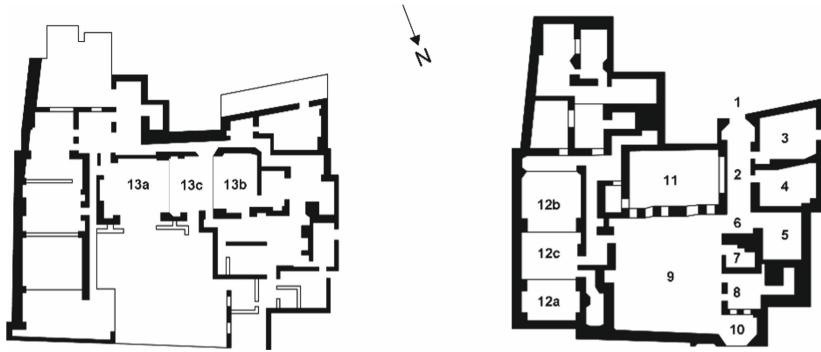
Harawi House, a typical Egyptian traditional house: first floor and second-floor plan [1. Magaz; 2. Entrance corridor; 3. Mill (store room); 4. Stables; 5. Guest room; 6. Covered porch; 7. Haramlik staircase; 8. Service room].
